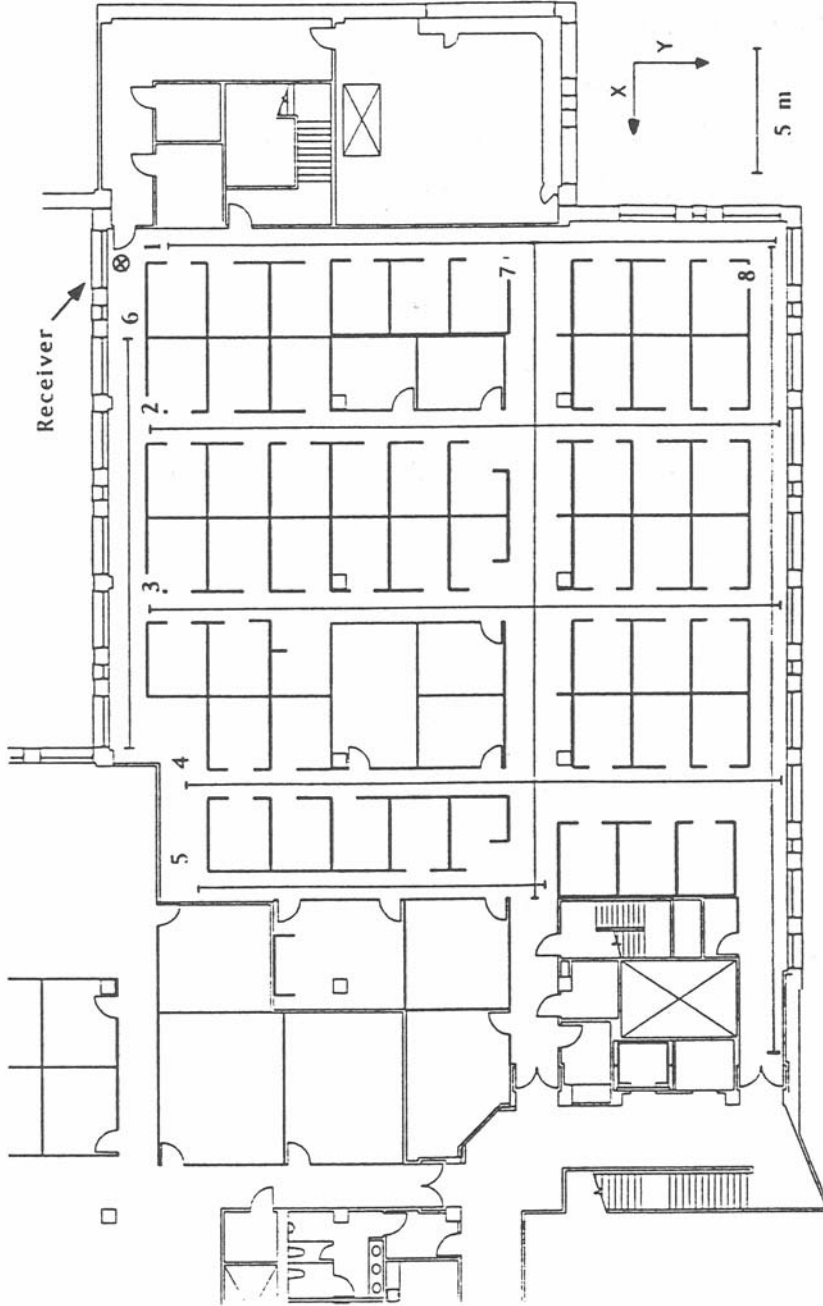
Site #3 US WEST Room 3200 floor plan with eight delay spread profile locations and receiver location.
